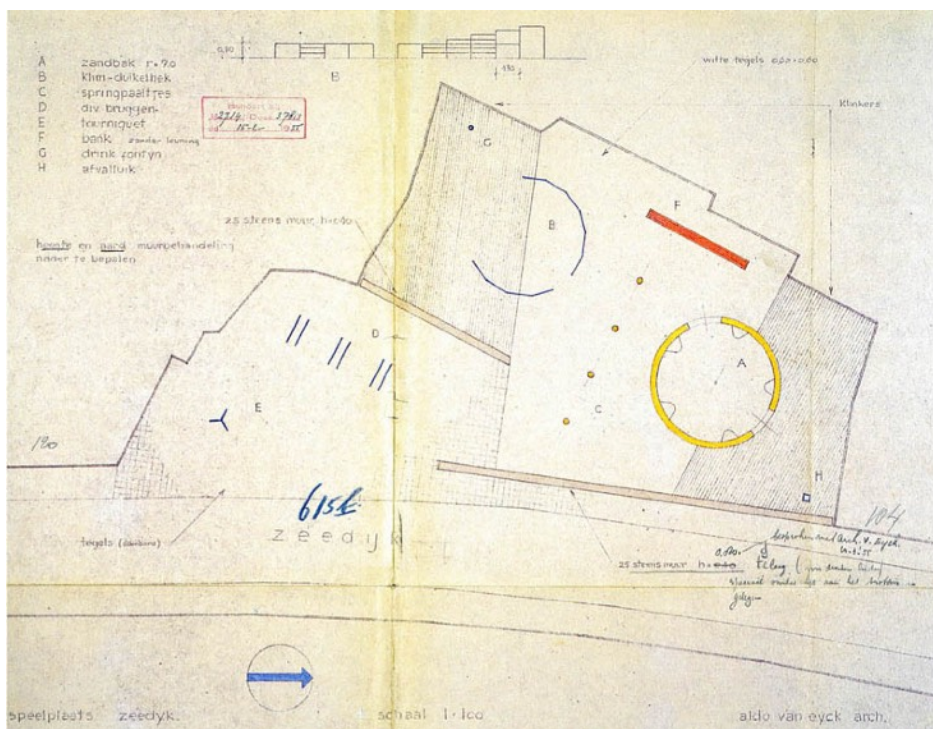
PLAN FOR PLAYGROUND AT ZEEDIJK OF FIGURE 4
